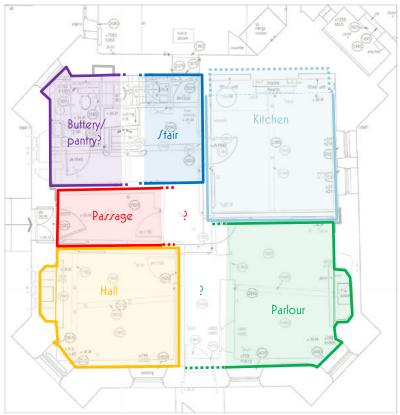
Ground-floor plan, hypothetical arrangement of original spaces.
